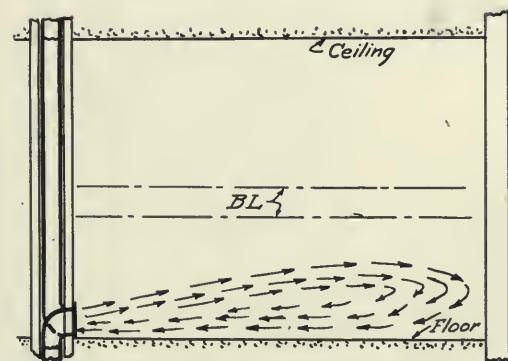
Section of classroom showing effect of locating both supply and exhaust openings at floor line.
